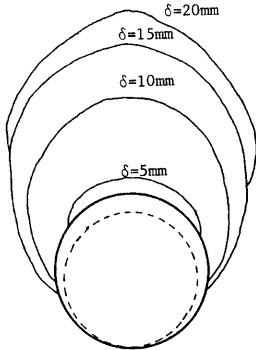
Development of loosened zone by model test of tunnel excavation, for high overburden.
